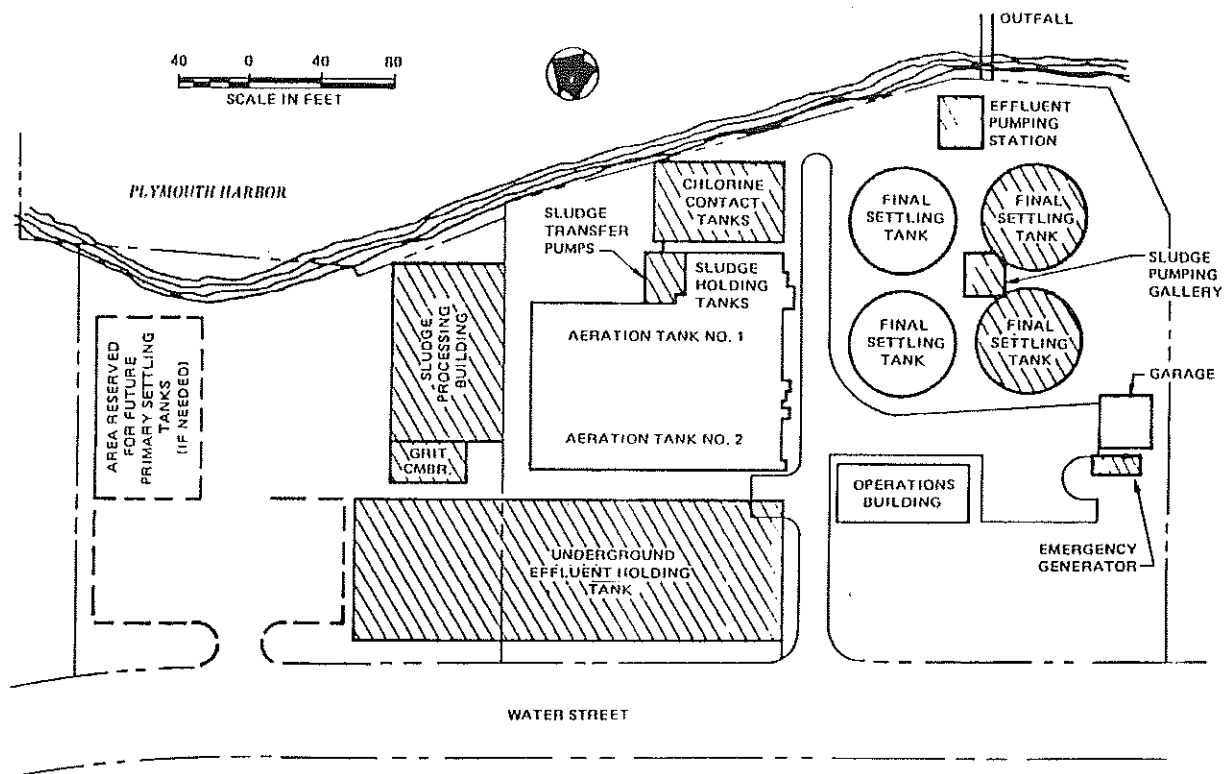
PROPOSED LAYOUT OF EXPANDED
